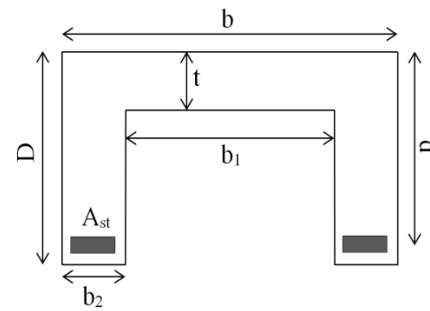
A typical U-Slab drawing used in Australia in 1950's and 1960's.
